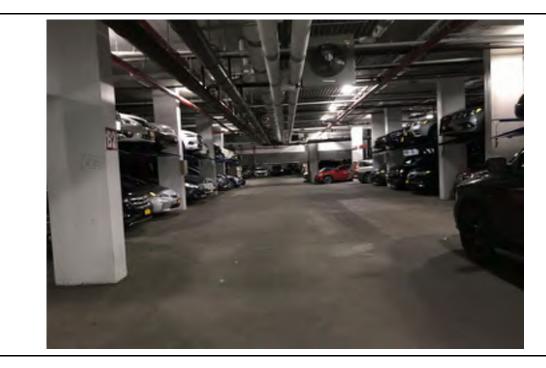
Subgrade parking garage concrete slab, facing northwest. 30 March 2021.
